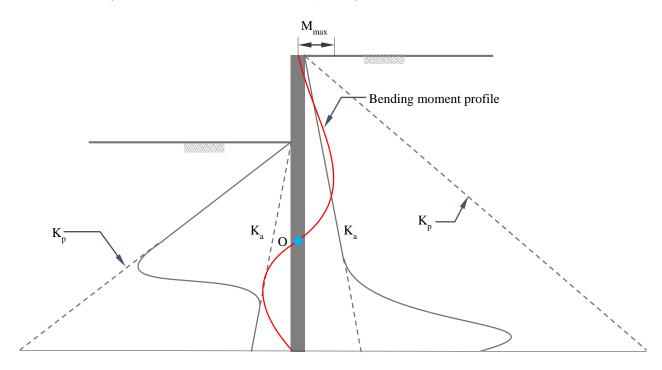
Calculation of Maximum Bending Moment in a Cantilevered Wall (modified from Padfield & Mair, 1984)
